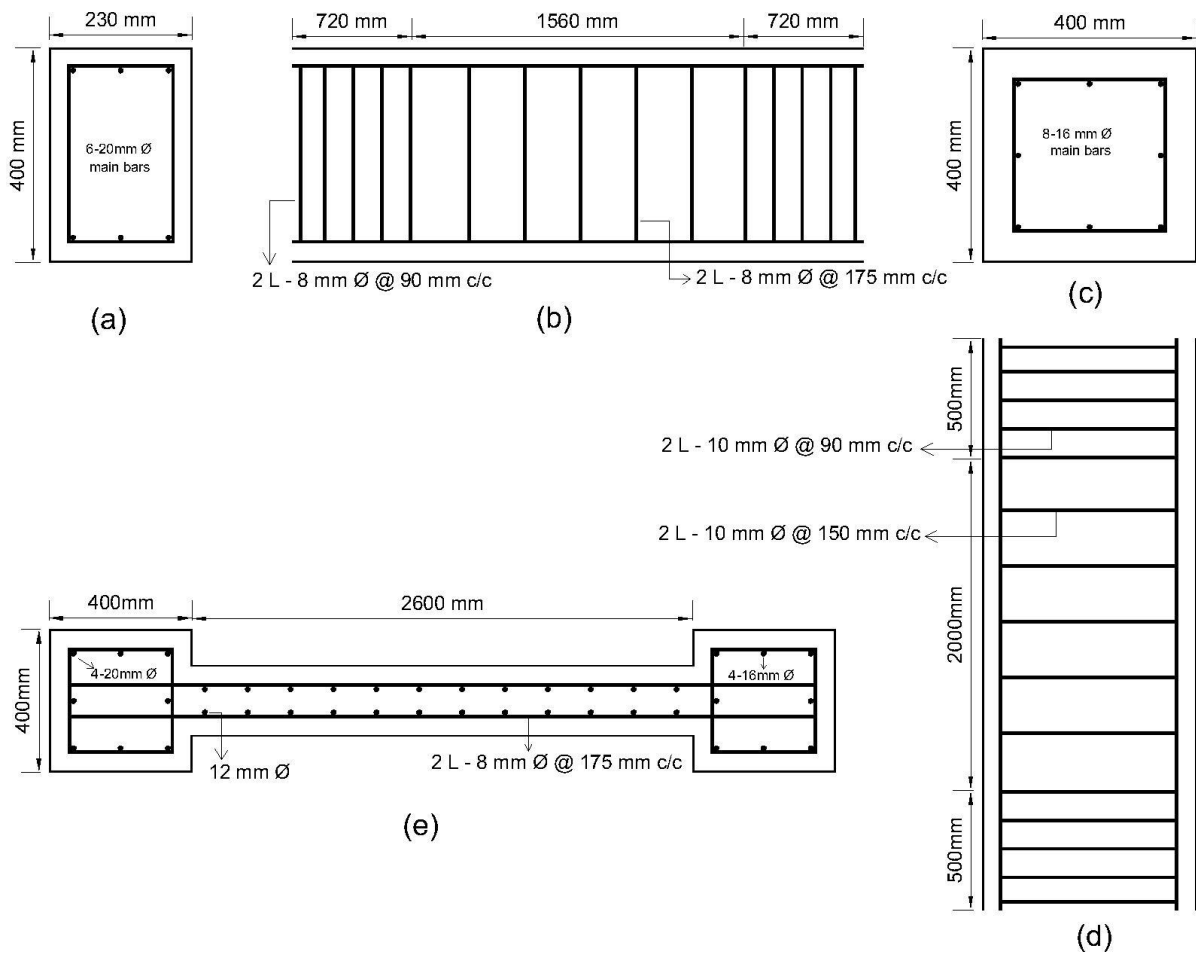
Reinforcement details in (a) beam cross-section, (b) beam longitudinal section, (c) column cross-section, (d) column longitudinal section and (e) RC wall cross-section.
